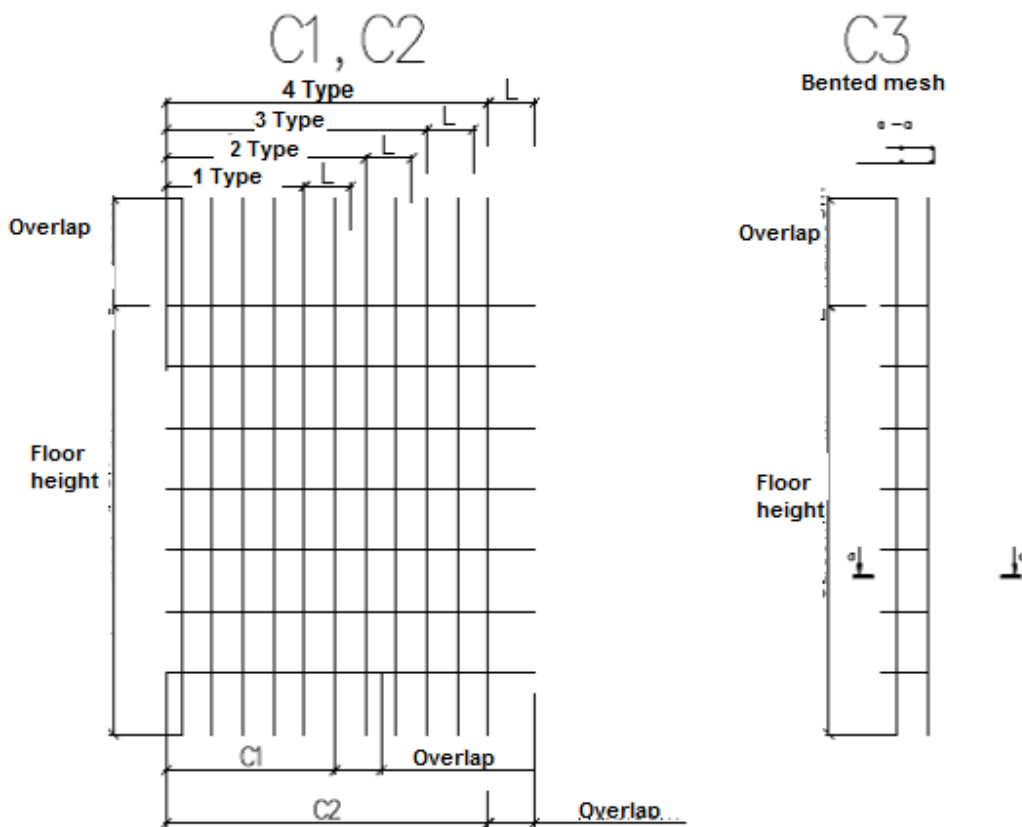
Example of reinforcement Oland, Saint-Petersburg
